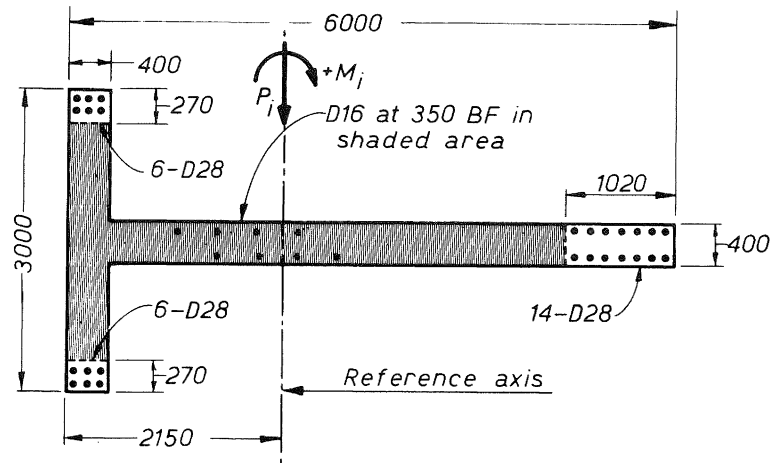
Sectional Properties of an Example Shear Wall Section.
